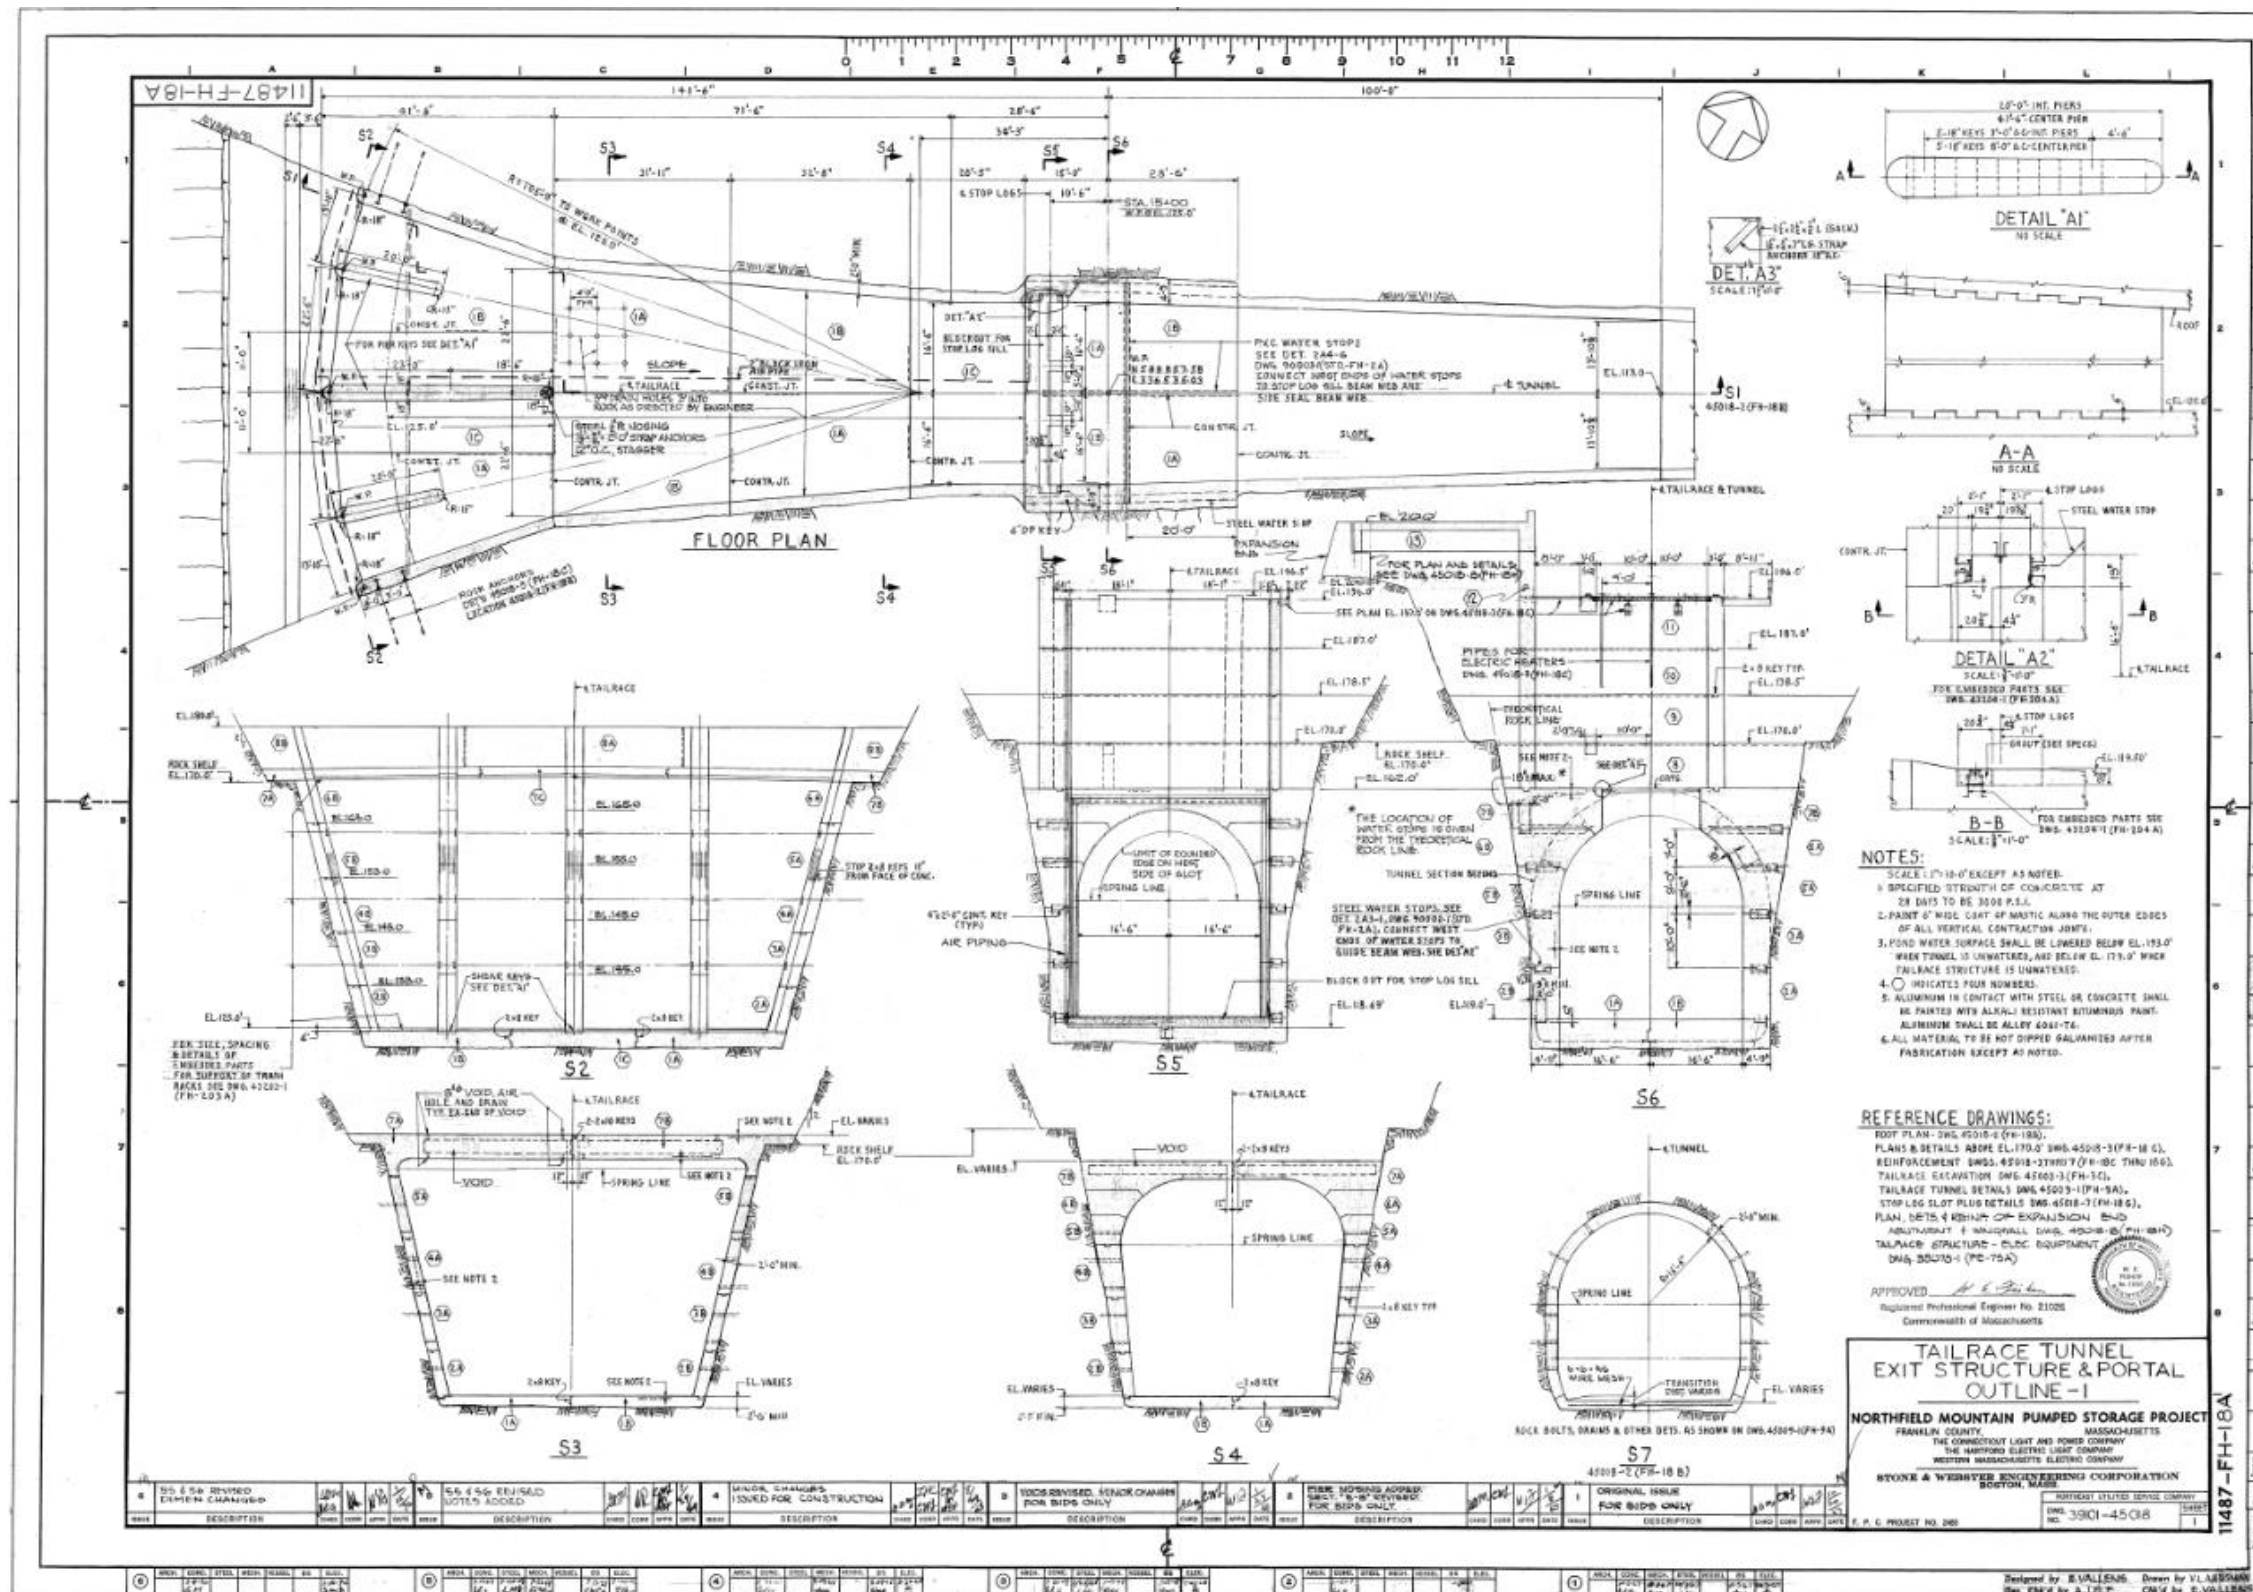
Tailrace Tunnel Exit Structure Plans (Reference 5)
